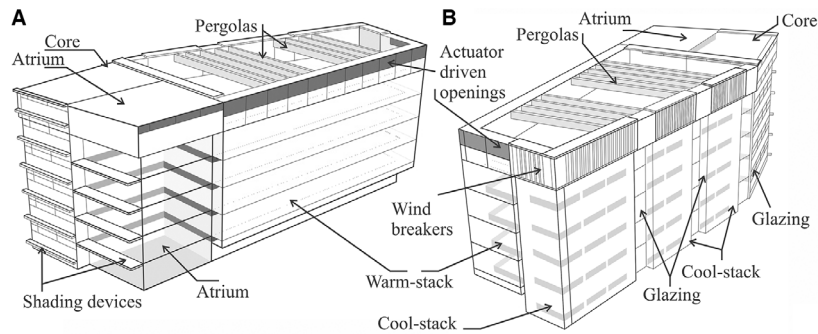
3D view of the case study building. (A) Southwest and (B) Northeast view
